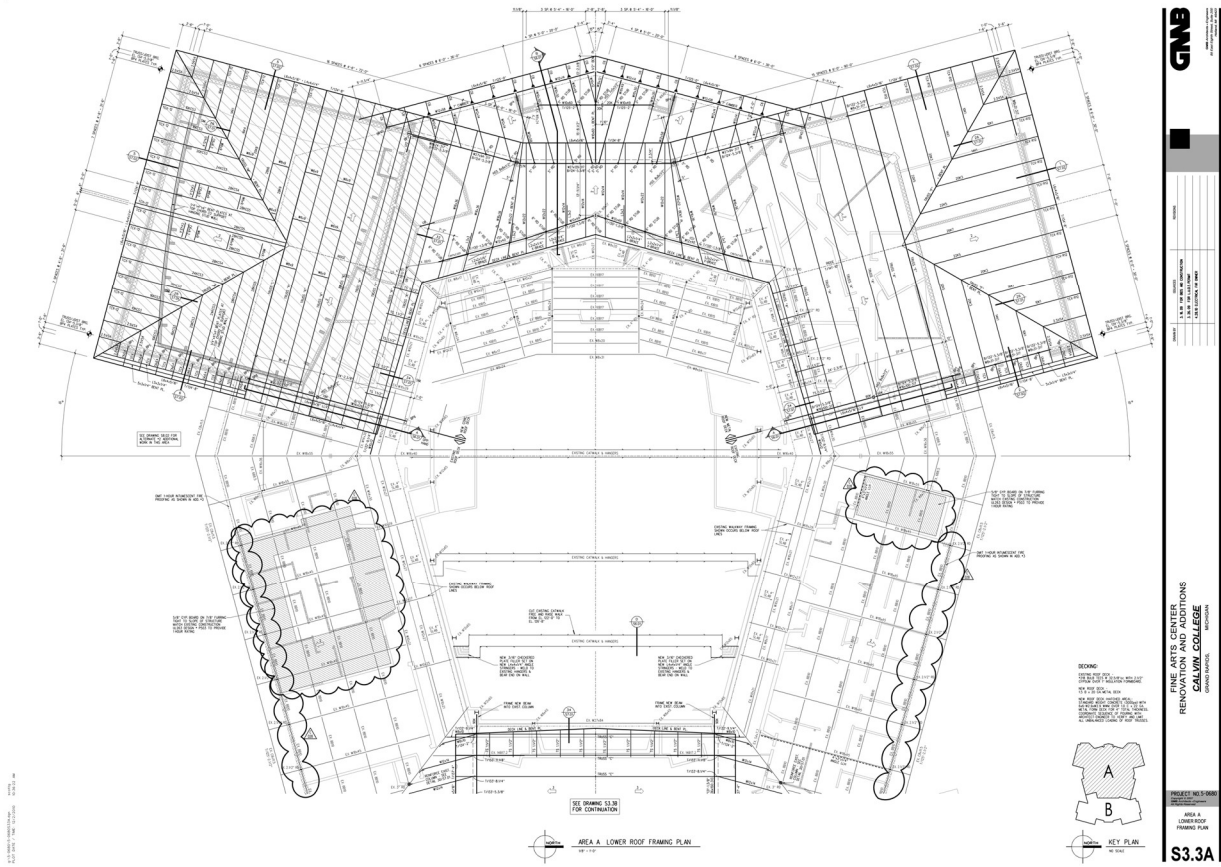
CFAC Structural Plans for Roofs 1,2,3.
